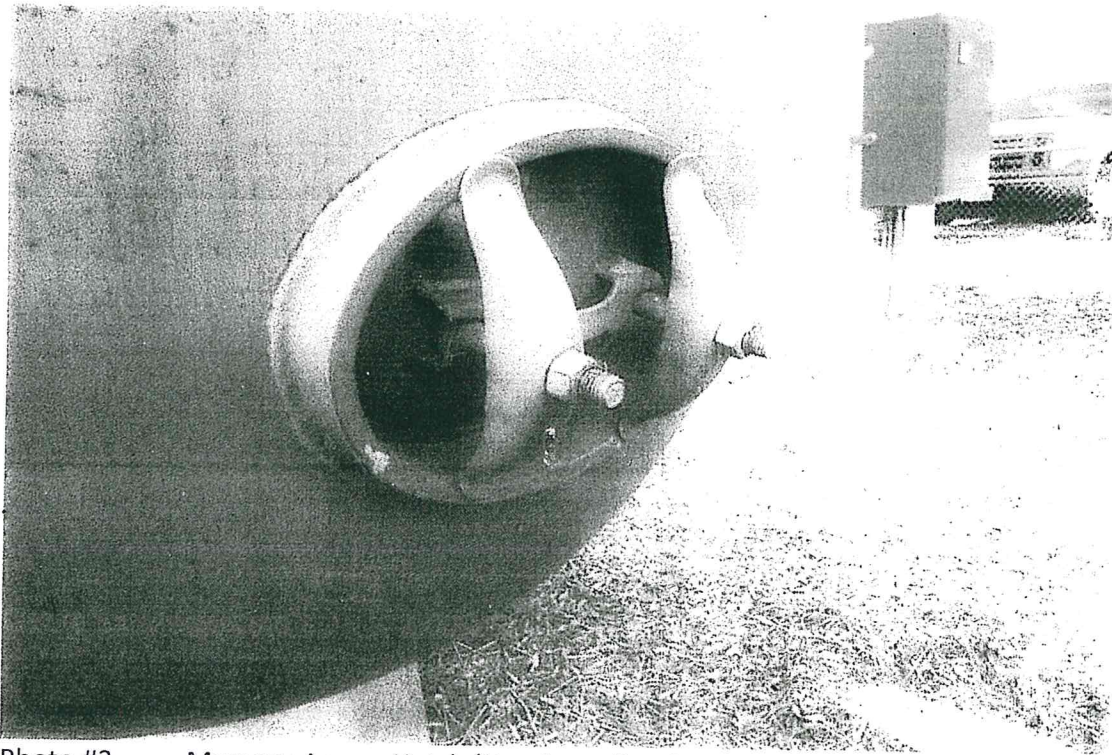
Manway Access Hatch (Needs confined space entry placard)
